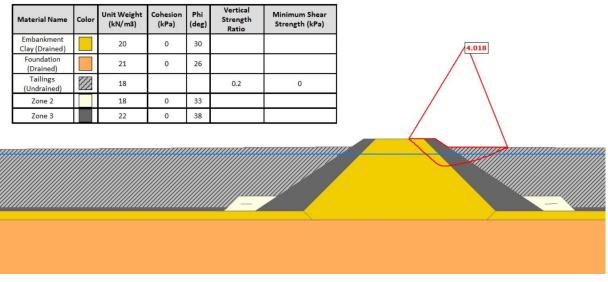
Slip Surface in Common Wall, Long-term Drained Loading Condition
